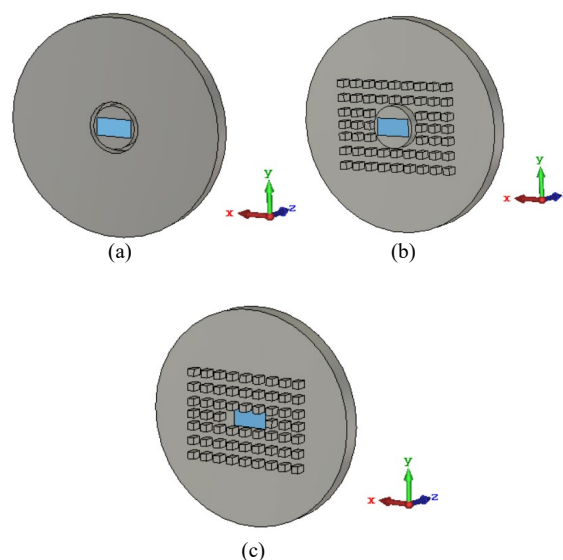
(a) choke flange; (b) pin-array flange with transformer; (c) pin-array flange without transformer.
